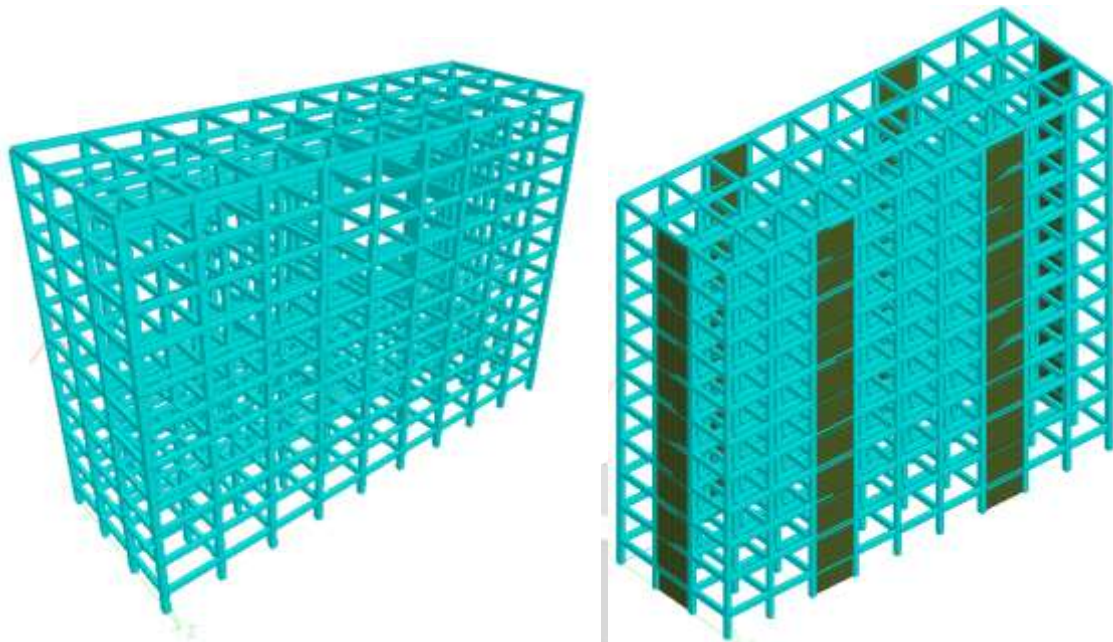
Structure of G+10 considering without shear wall and considering shear (plain and composite wall)
